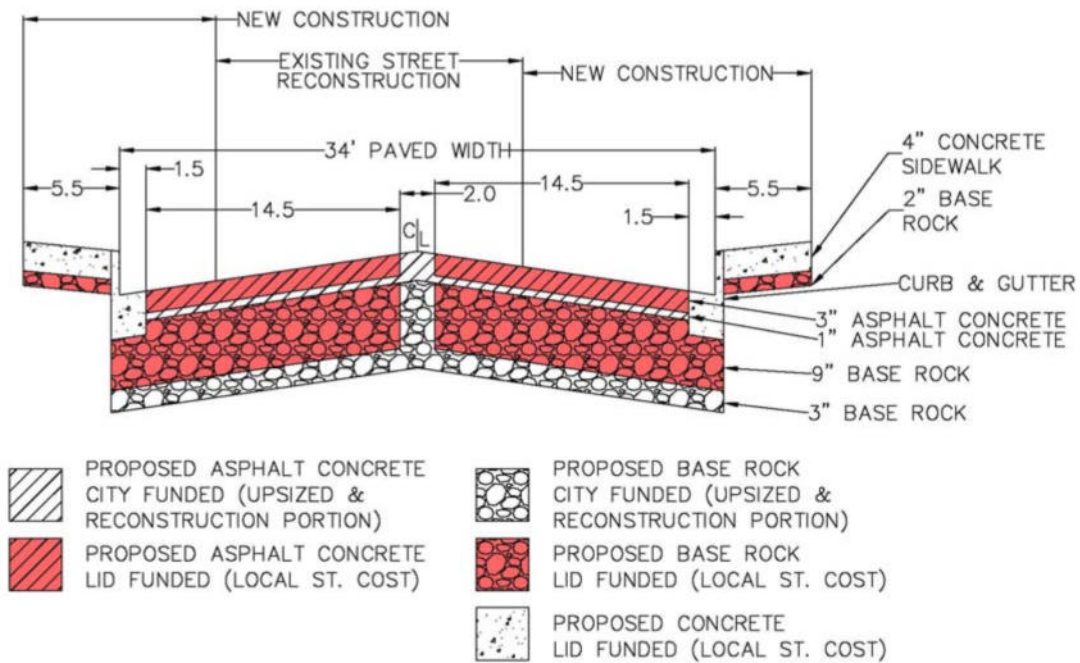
GROUP B CROSS SECTION 1 (NORTH IS LEFT)
